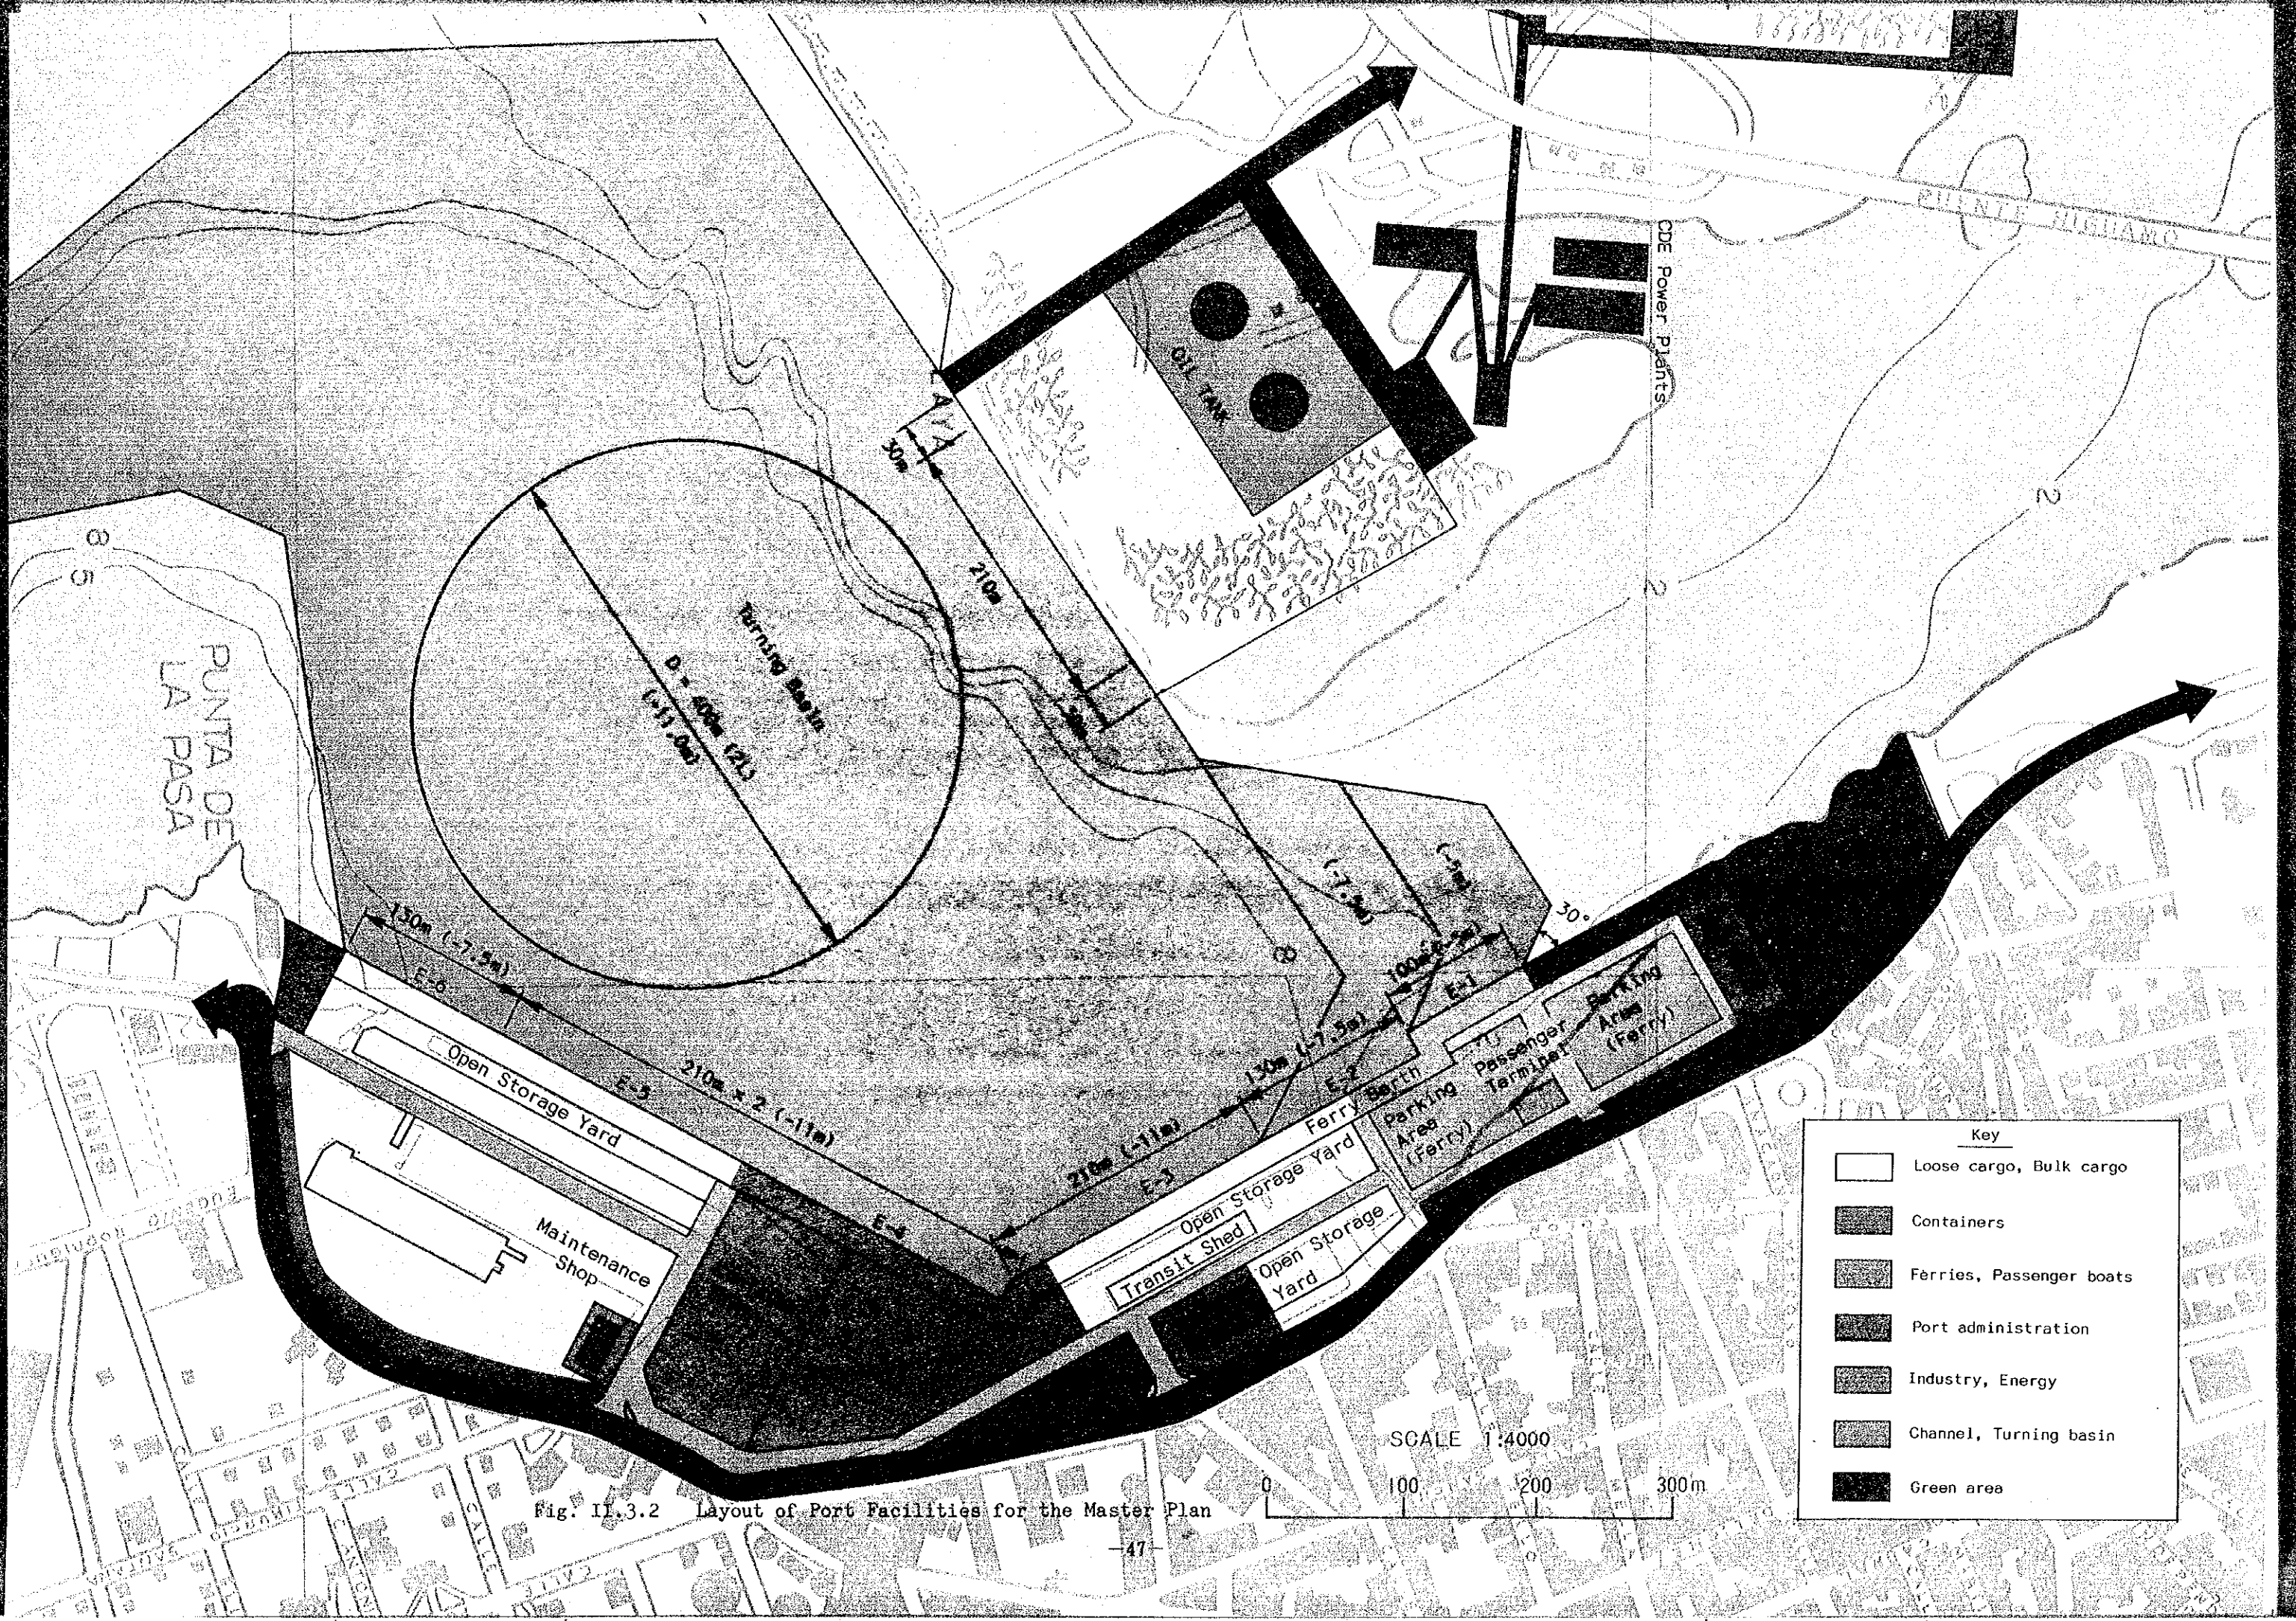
Layout of Port Facilities for the Master Plan
